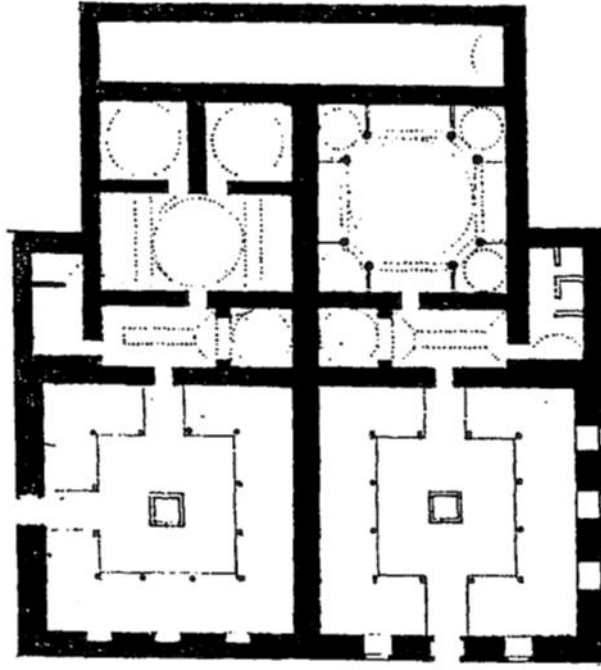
Plan of Azap Gate Sokullu Mehmet Pasha Bath (Haskan, 1995).
